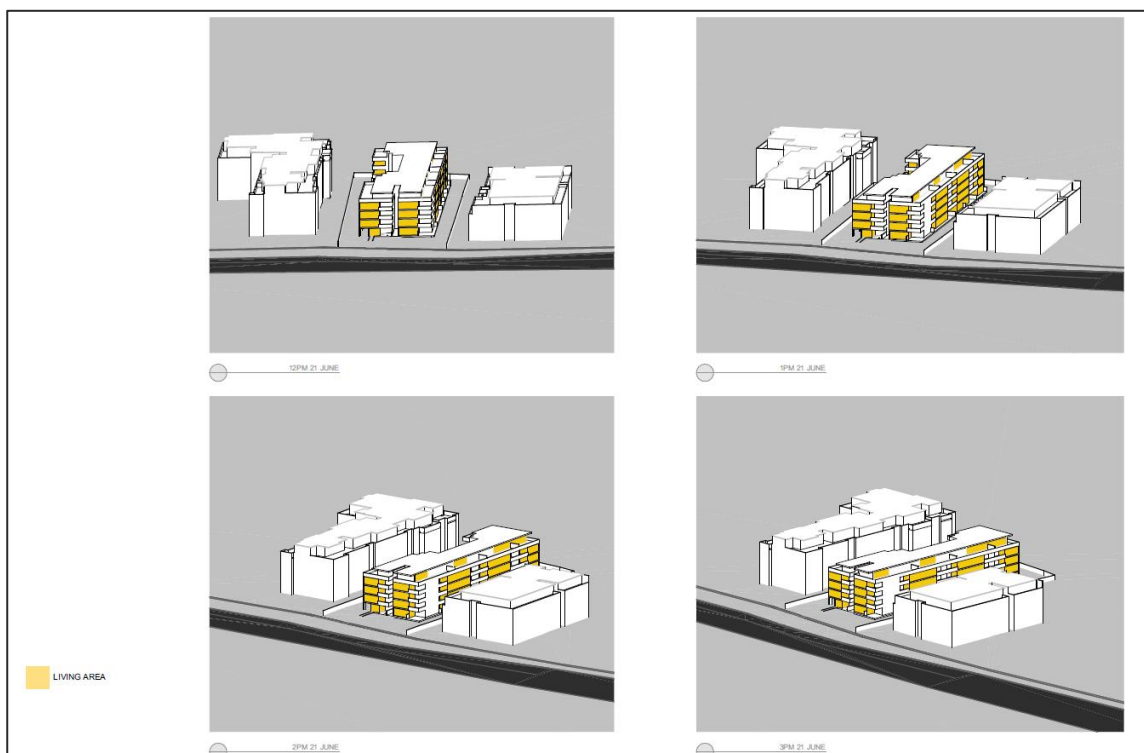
Proposed building massing with 12pm-12pm solar access (Source: mackenzie architects concept architectural plans)
